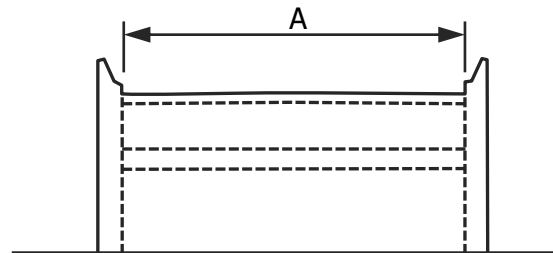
Cross-section view of a filled arch bridge under fill, or culvert, under fill with headwalls.
